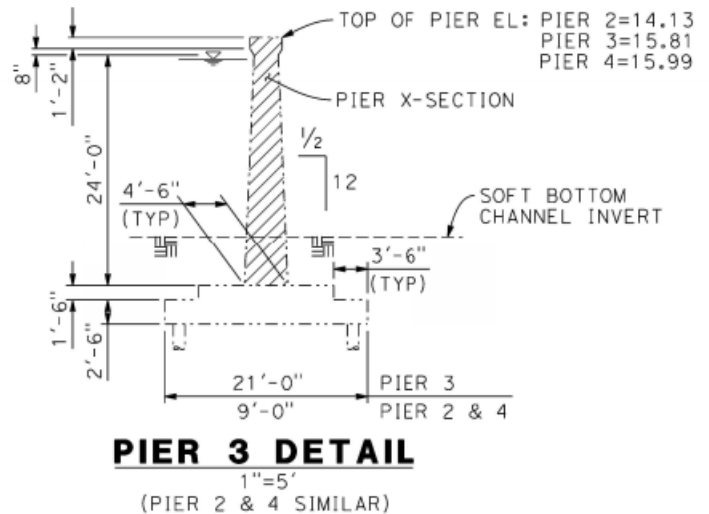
Pier Detail, Existing Lincoln Boulevard Bridge over the Ballona Creek
